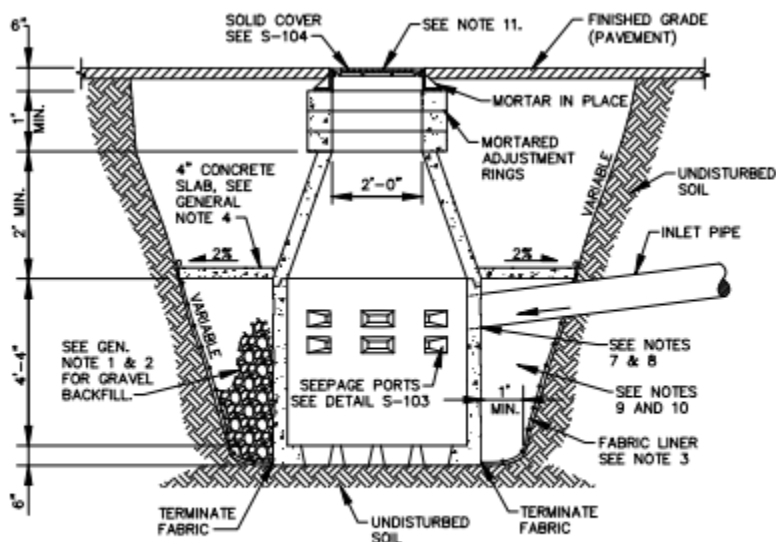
DRYWELL STANDARD PLAN S-102, SVSS
